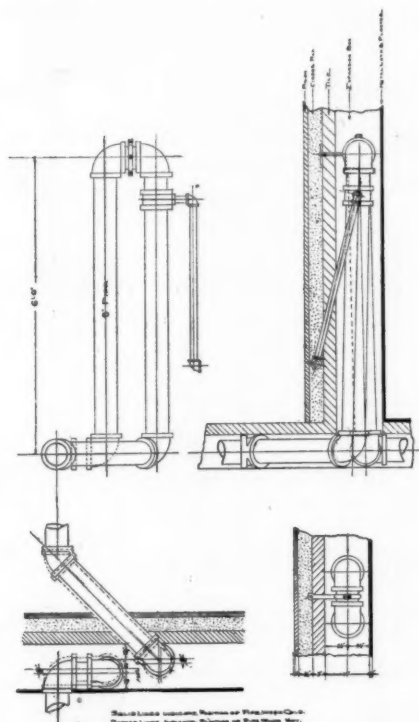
TYPICAL EXPANSION LOOP IN RISERS.
